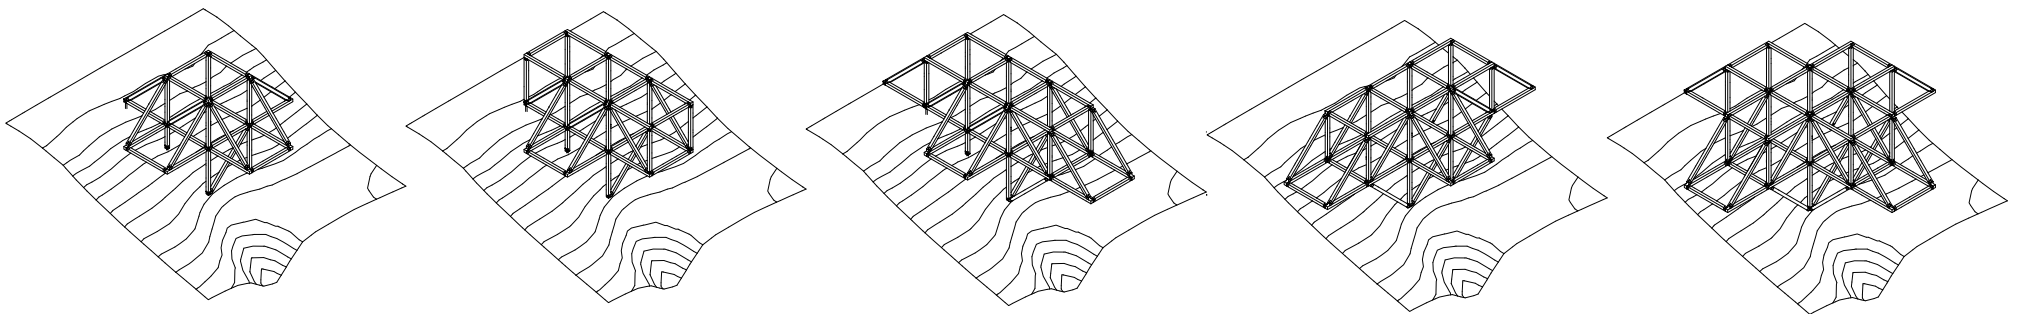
Adaptability of a Mass Timber ADU with an exo skeleton GLT structure (left to right). 1) the module 14'x 14' over the hillside. 2) The module increases in one direction. 3) The module takes advantage of diagonal beams to have more support over the hillside. 4) The module increases in the opposite direction. 5) The module increases in both directions, by the Author.
